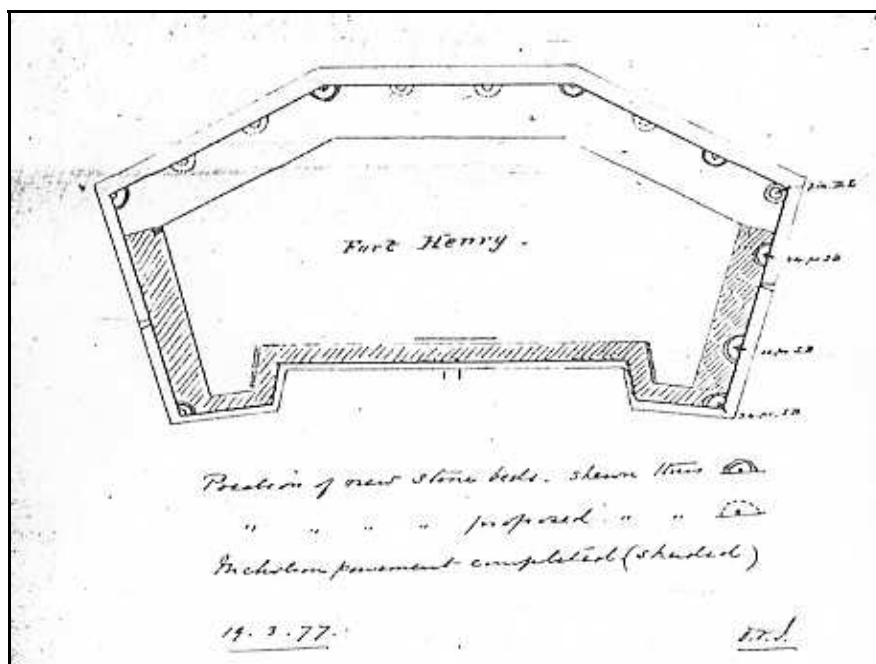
Positions of new and proposed stone beds and Nicholson Pavement, shaded, 19 March 1877. NA, RG11, Vol. 542, p. 963.
